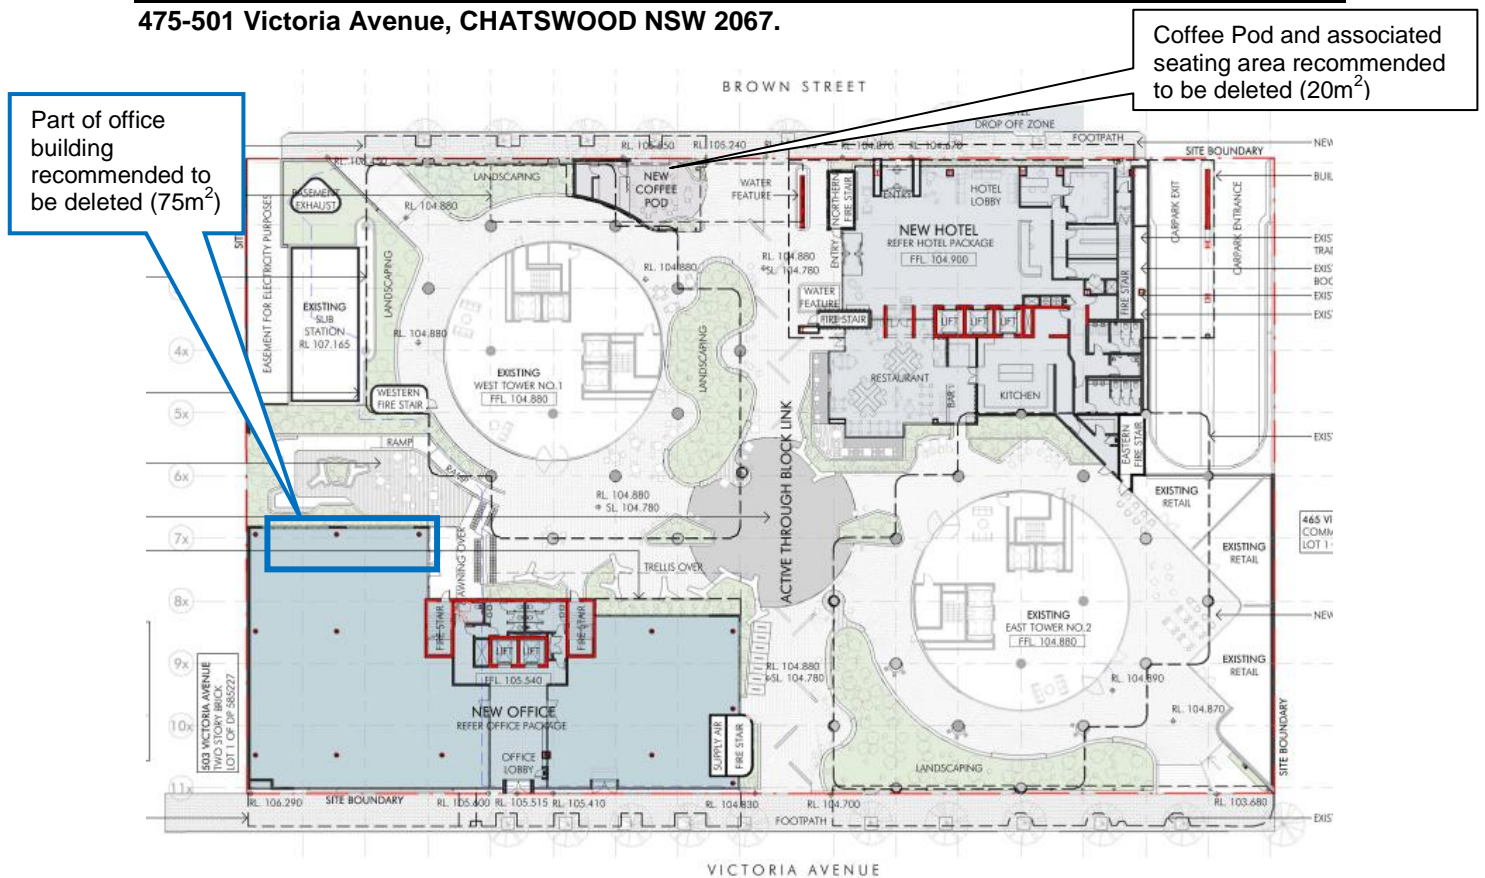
Overall Ground Floor – Drawing No. Q3294_DA0105
